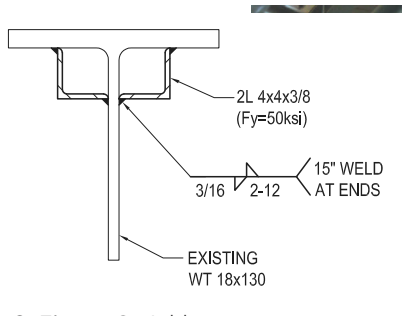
Adding office space atop what was previously the roof required reinforcing the existing steel roof trusses.
